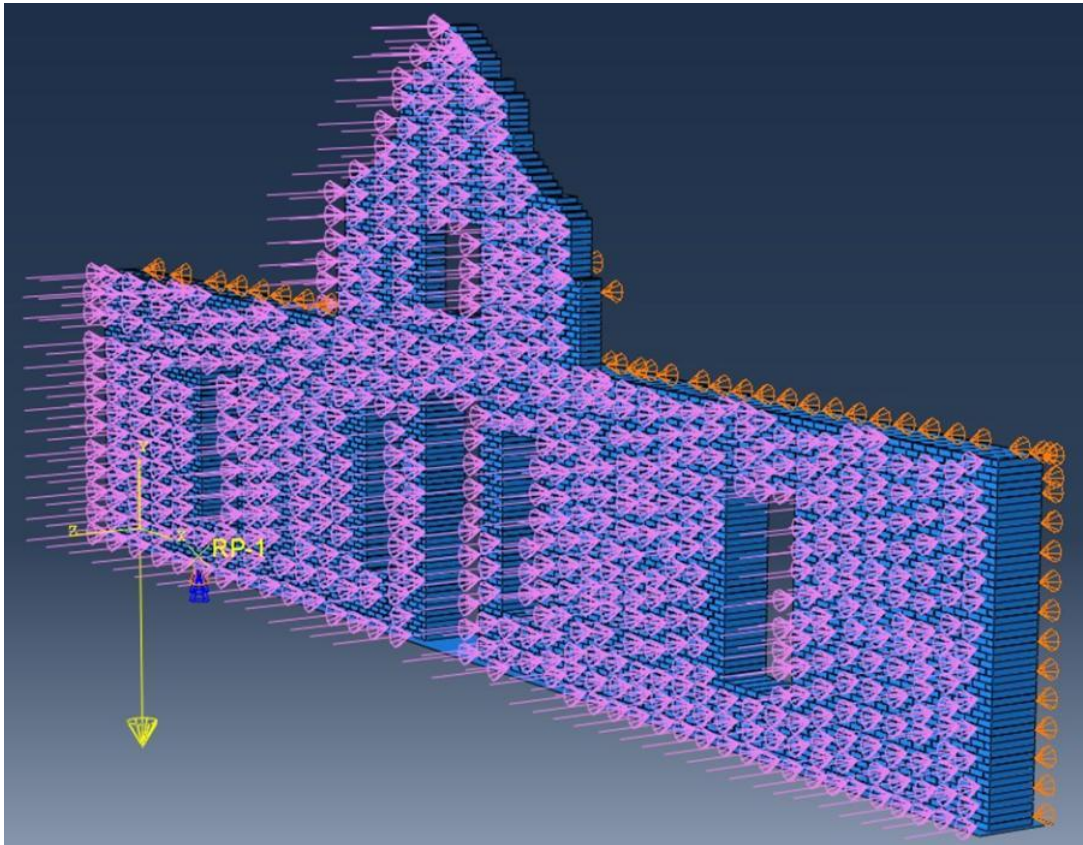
Masonry wall with wind load in the Z-direction (horizontally)
